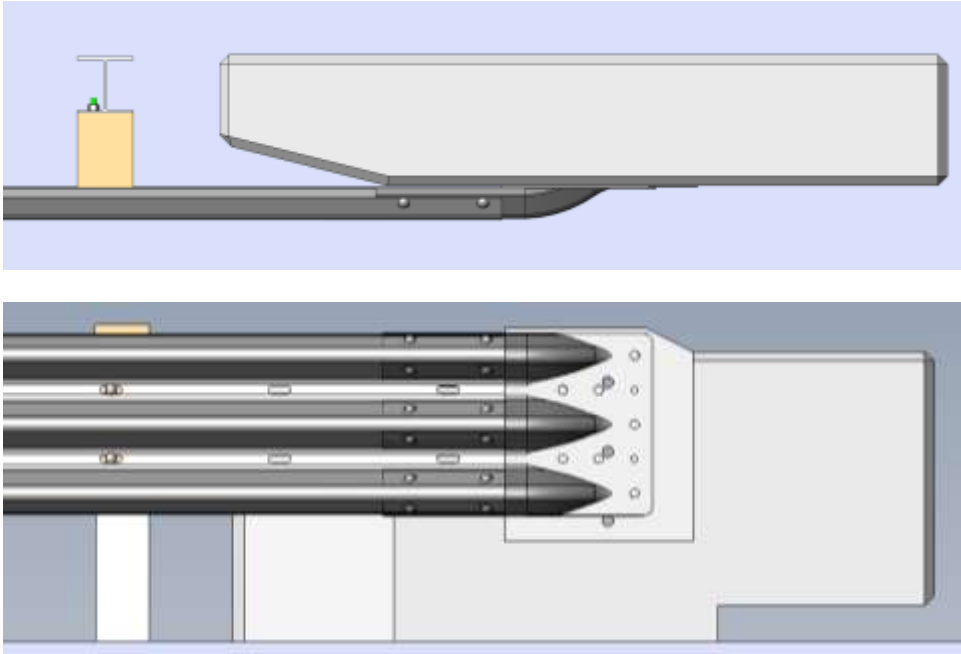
AGT with Connector Plate Assembly with Buttress 5
